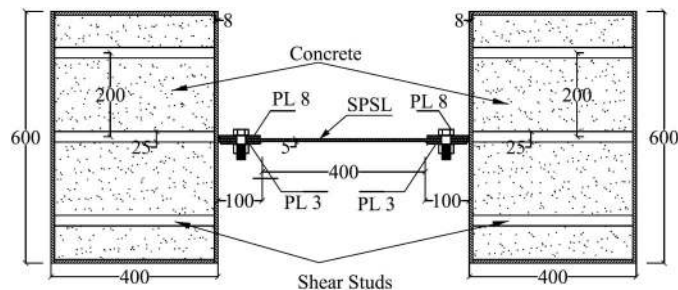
Column cross-section details and dimensions in mm for Specimen S1 (plan view cross section)
